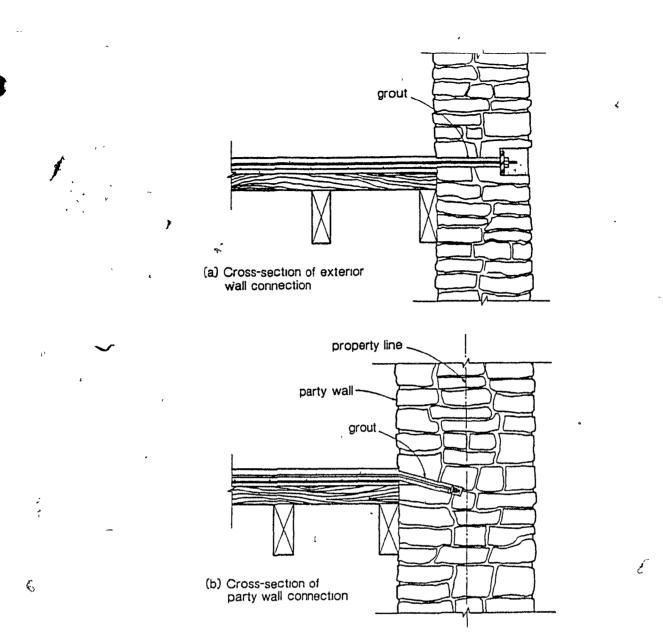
Cross-Section of Strengthening Measure for an Unreinforced Masonry Wall.
